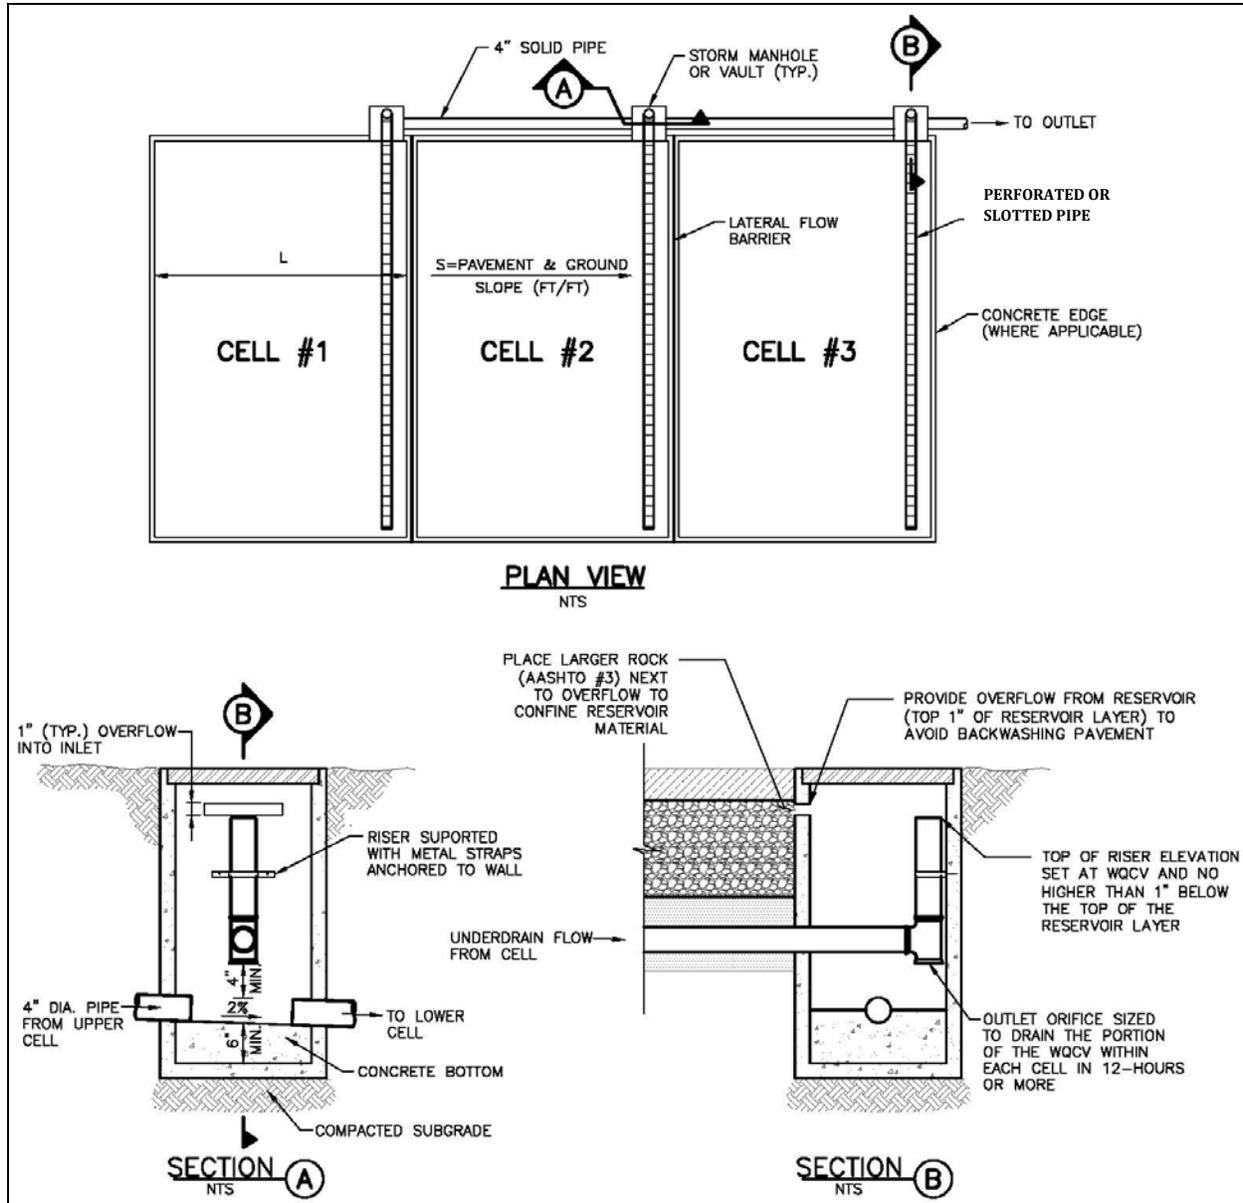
Underdrain system for partial or no infiltration pervious pavement sections (Source: UDFCD, 2013).
